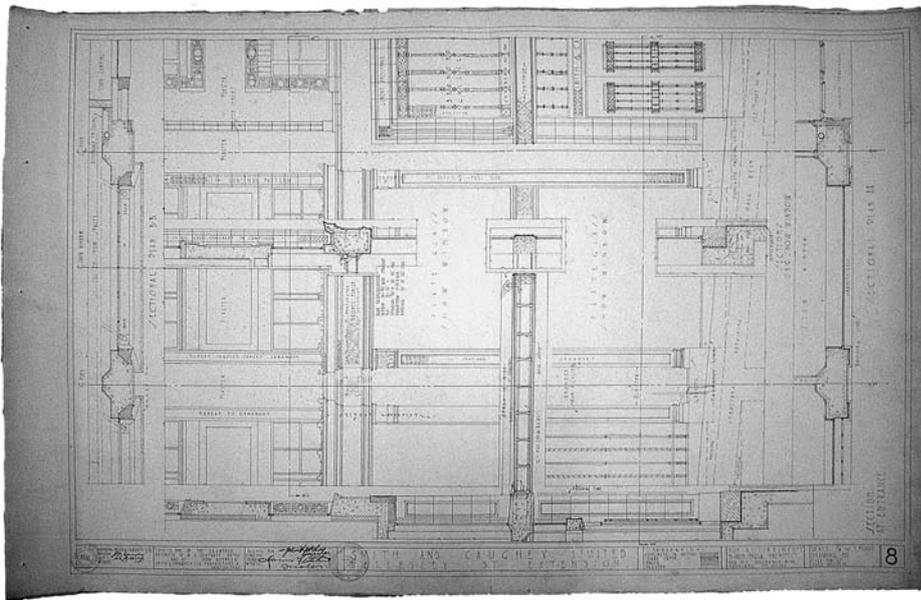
Lippincott, 'Sheet No.8: Section at Entrance, and Sectional Plan A-A, Smith & Caughy Limited, Wellesley Street Extension'. UoA Architecture Archive.
